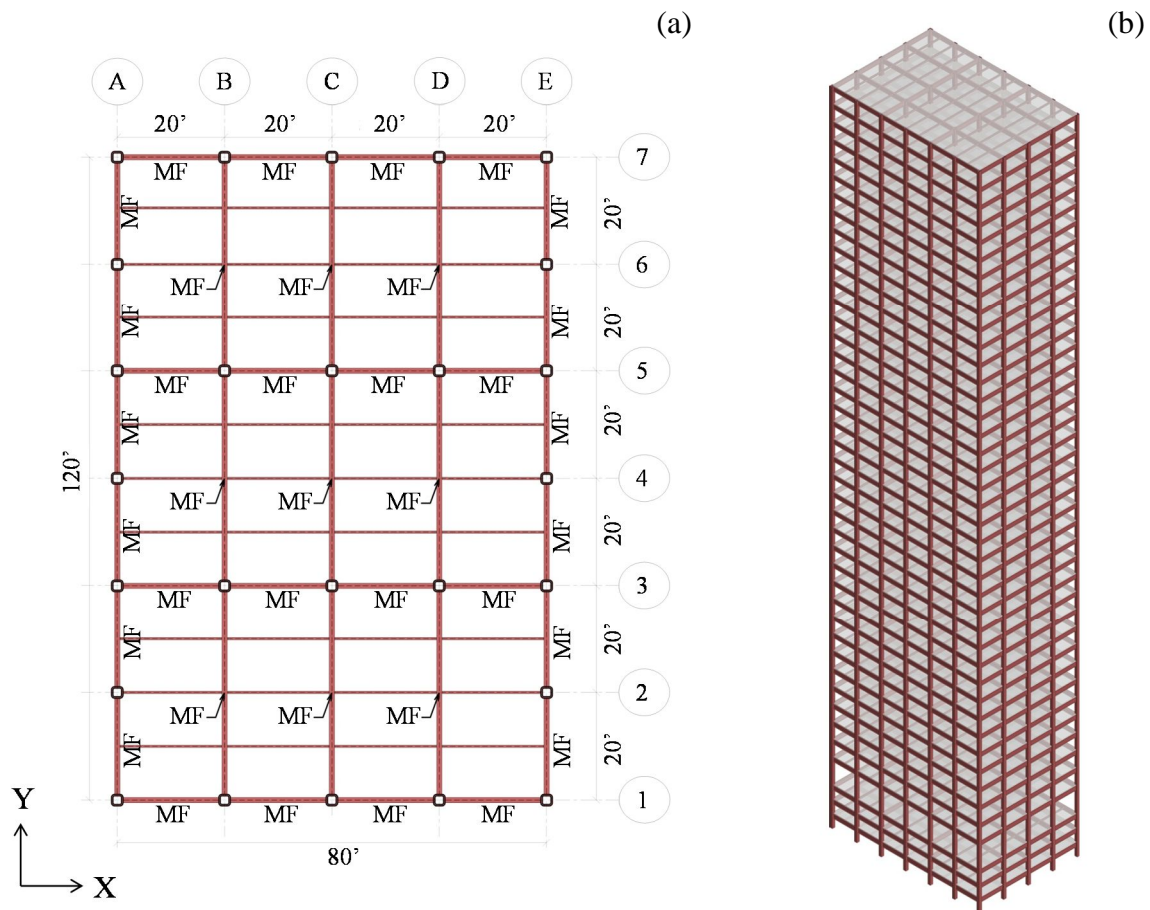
Archetype 40-storey office building plan (a) and isometric (b).
